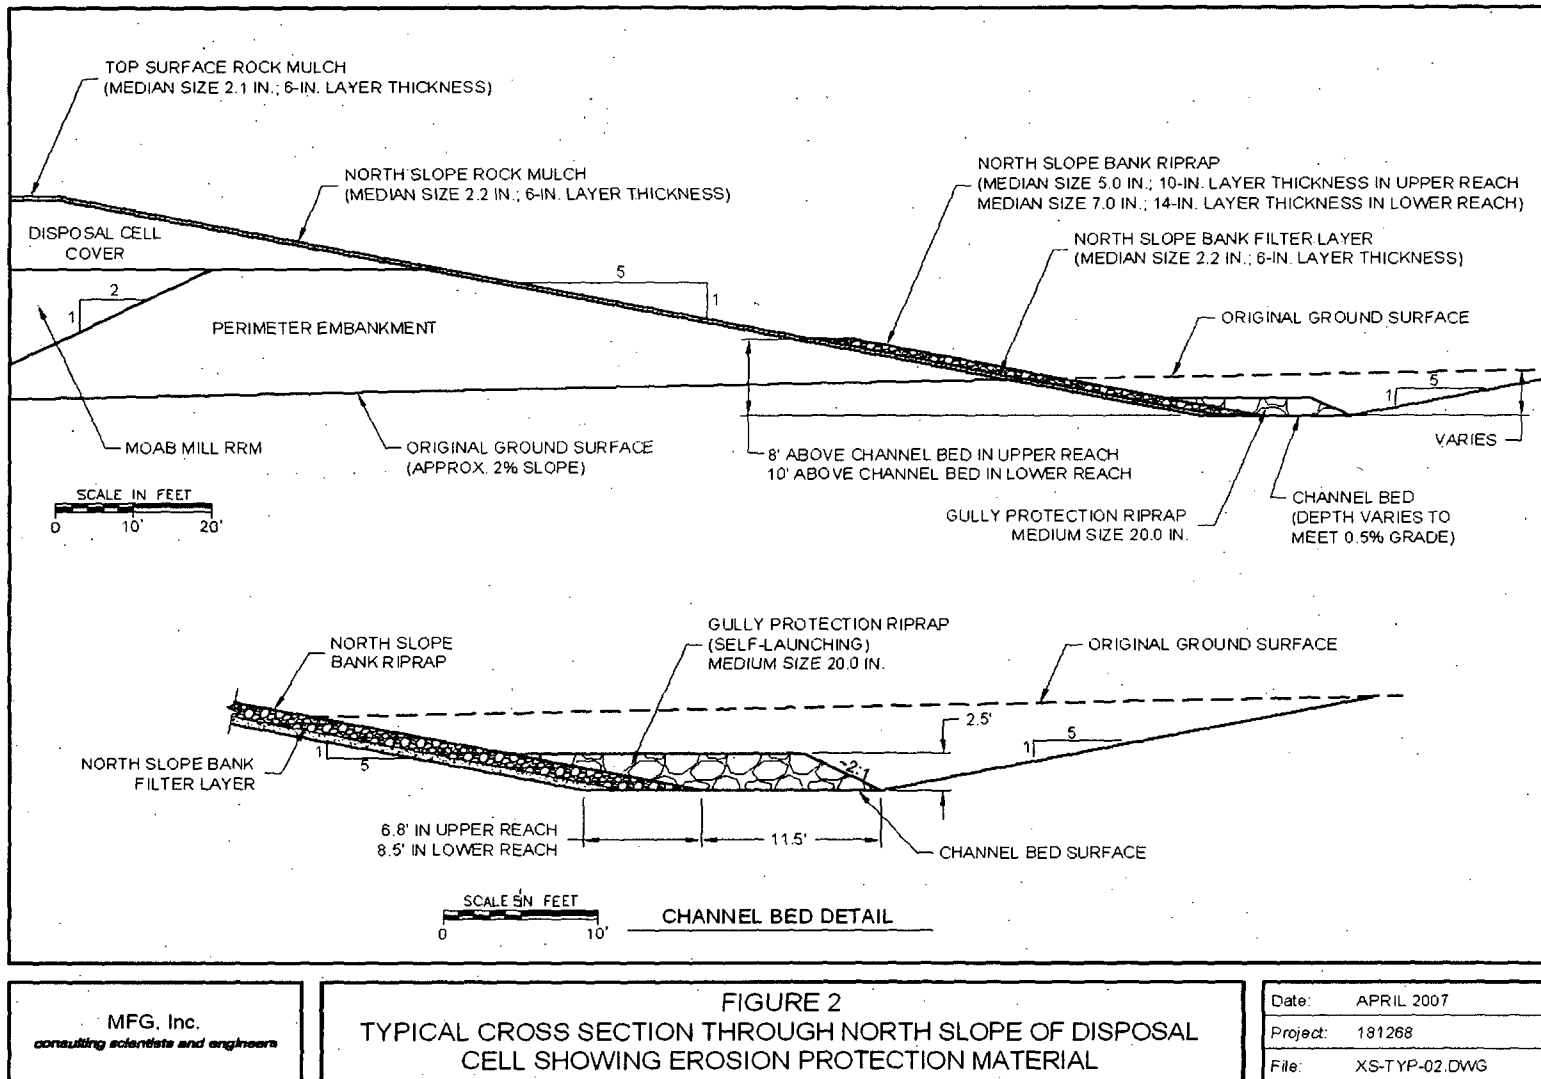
Typical Cross Section Through North Slope of Disposal Cell.
